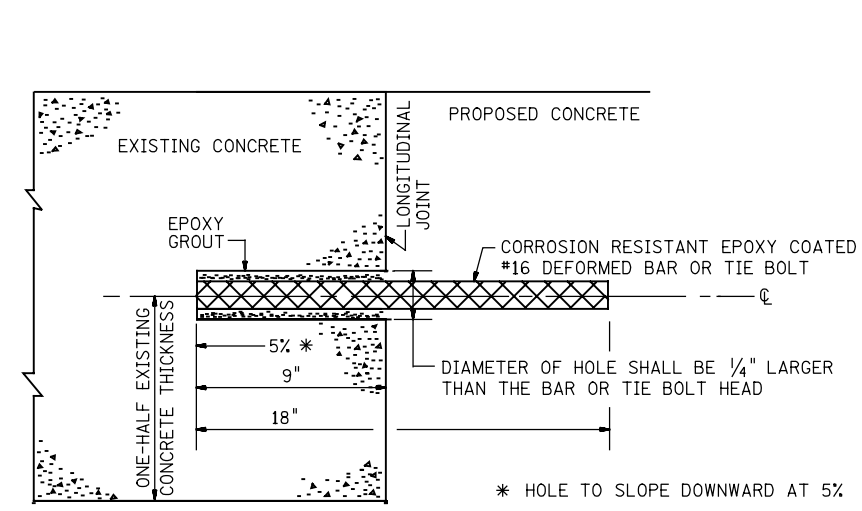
DETAILS OF JOINT BETWEEN EXISTING CONCRETE TO REMAIN AND PROPOSED CONCRETE
